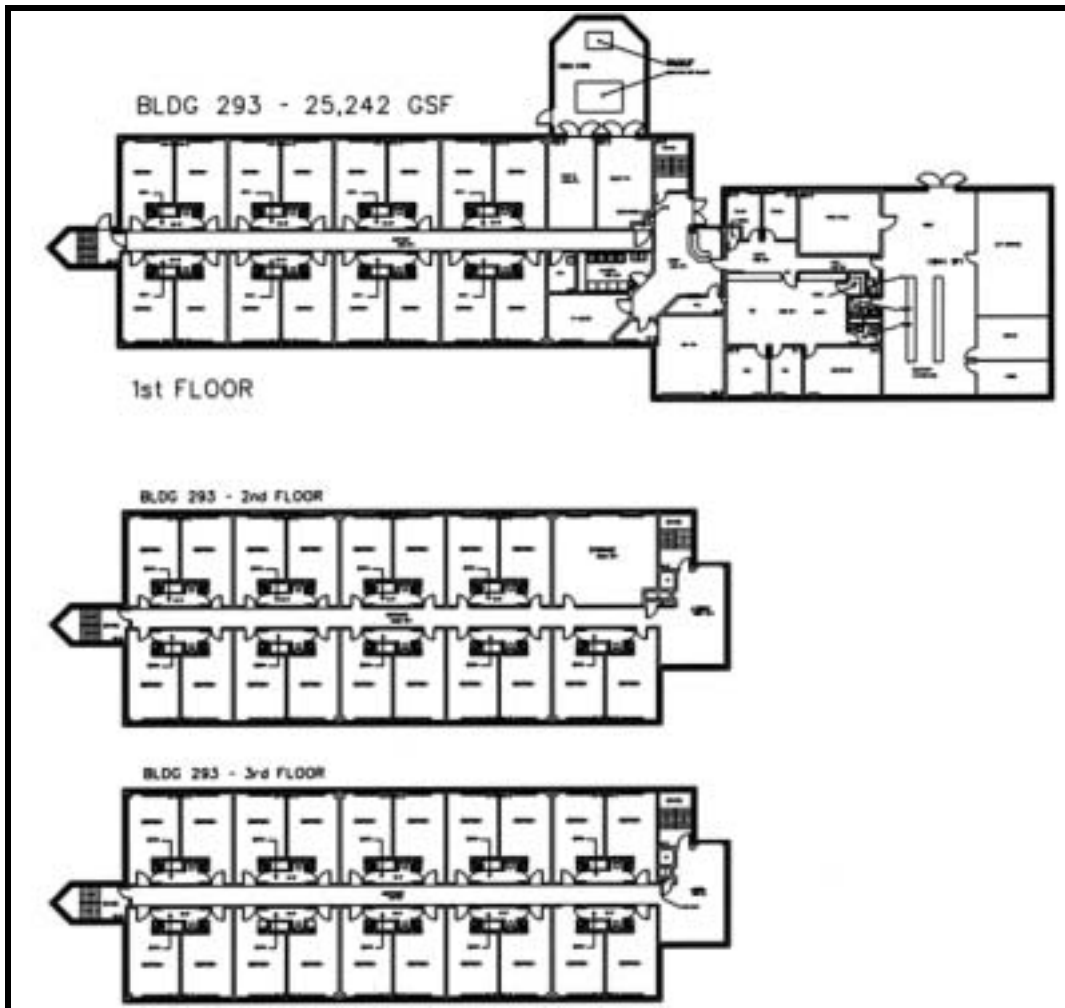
MEDDAC barracks, floor plans, Ft. Polk (ca. 1986) (Engineering, Ft. Polk).
